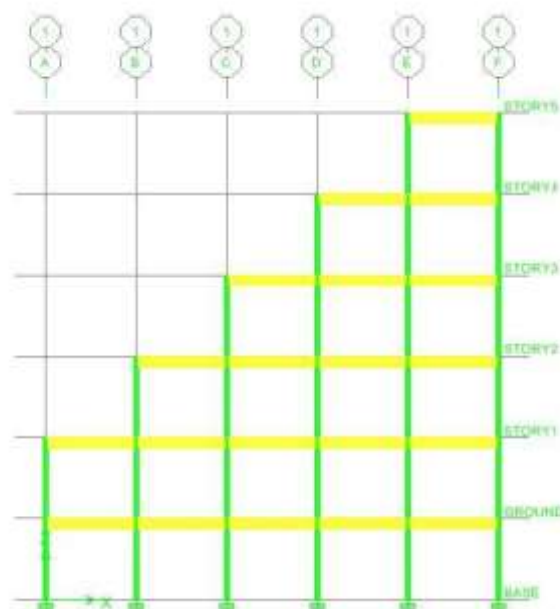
Elevation of setback building for five storey model (00 slope)
